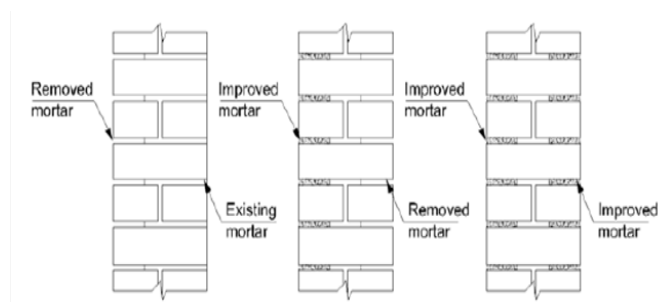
Repair and strengthening masonry by replacing mortar in horizontal joints
